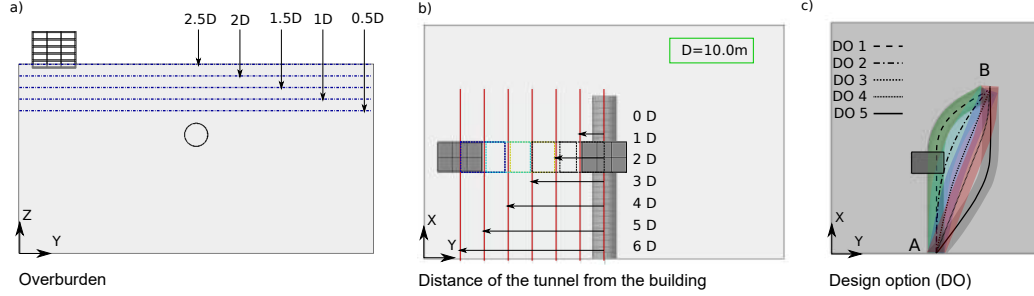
(a) Overburden of tunnel w.r.t. foundation of the existing building; (b) design options for the straight tunnel in terms of distance of the tunnel alignment from building; (c) design options for the curved tunnel.
